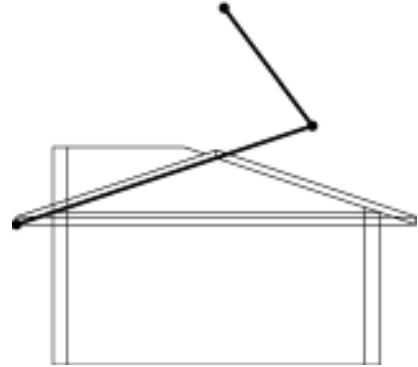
Cut 3D Object - Cut Walls to Roof Line - IV
